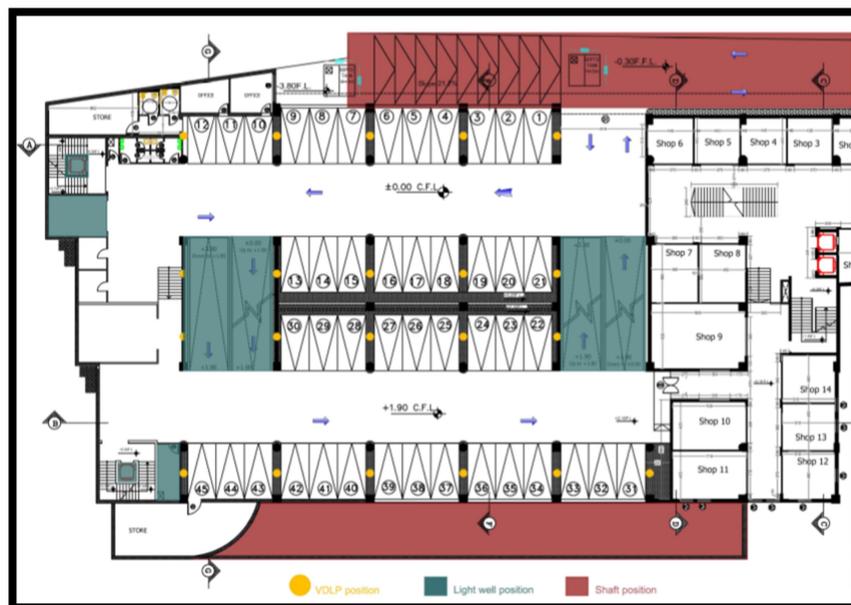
Basement 1 floor in Hebron parking, this figure shows the position of ventilation and daylight tools.
